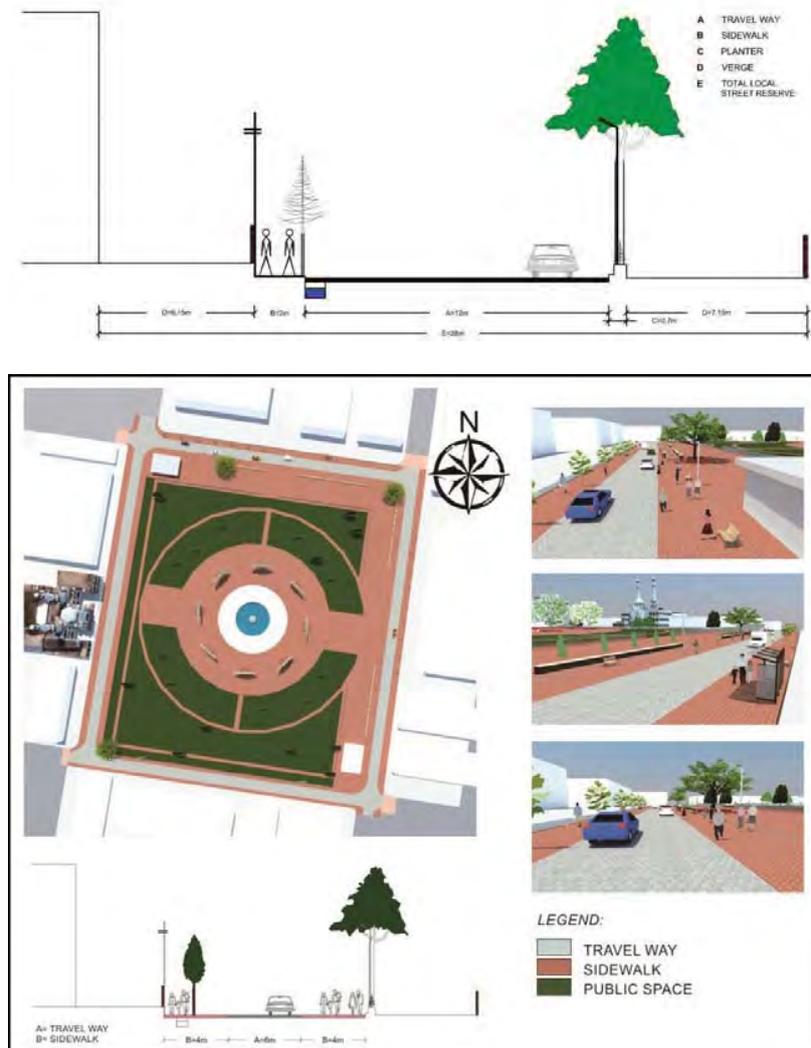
The design concept of BRO and cross-section of BRO design in the City centre plaza
